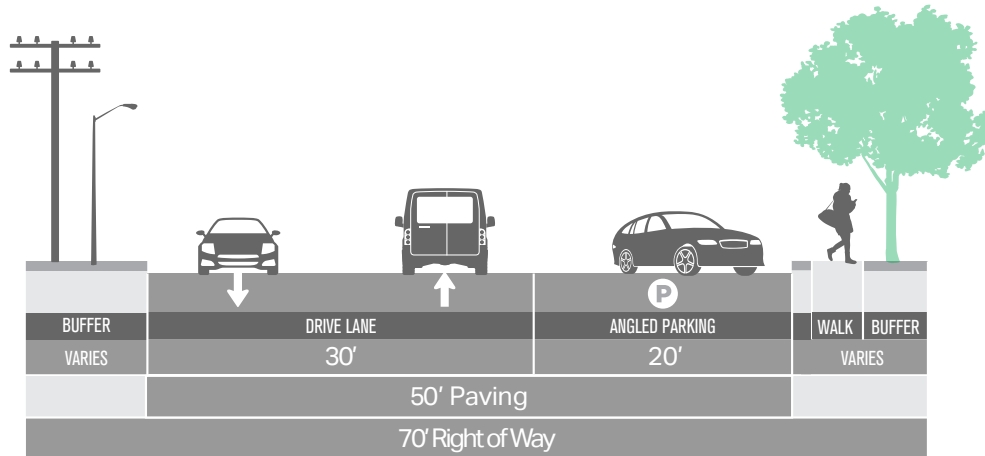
Existing Typical Edwards Street Section with Head-in Angle Parking
